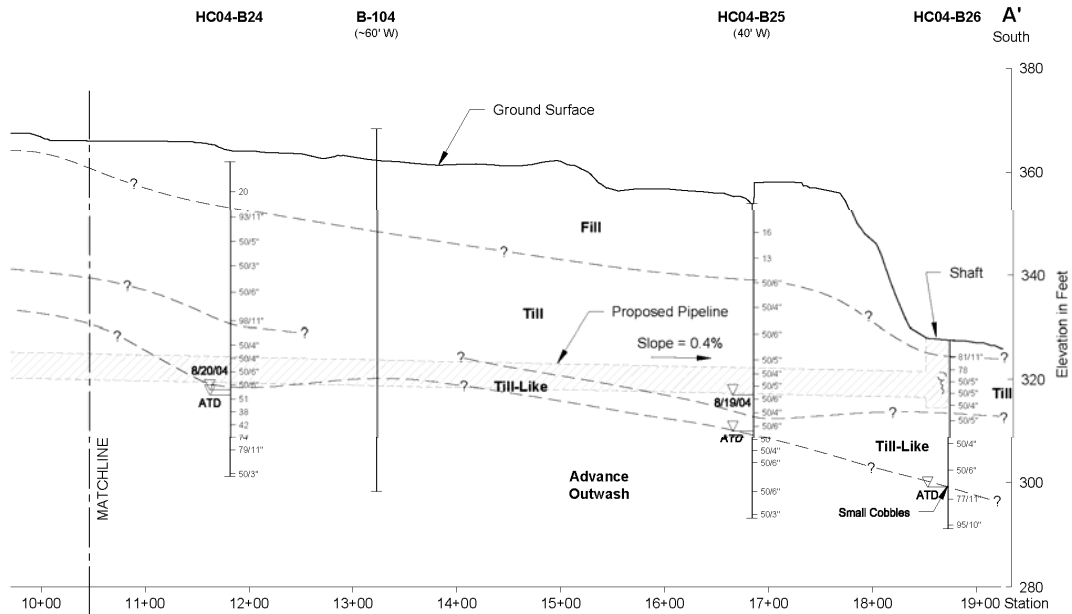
Cross Section of 1,182-foot Drive with Geotechnical Interpretation
